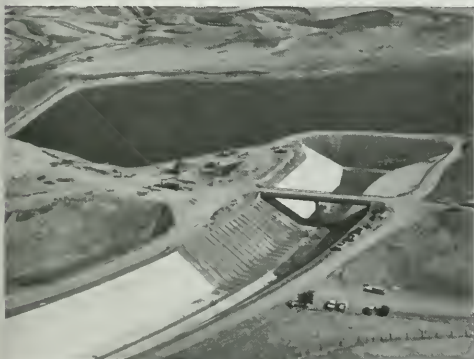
Bethany Forebay and Excavation for Adjacent Dams
